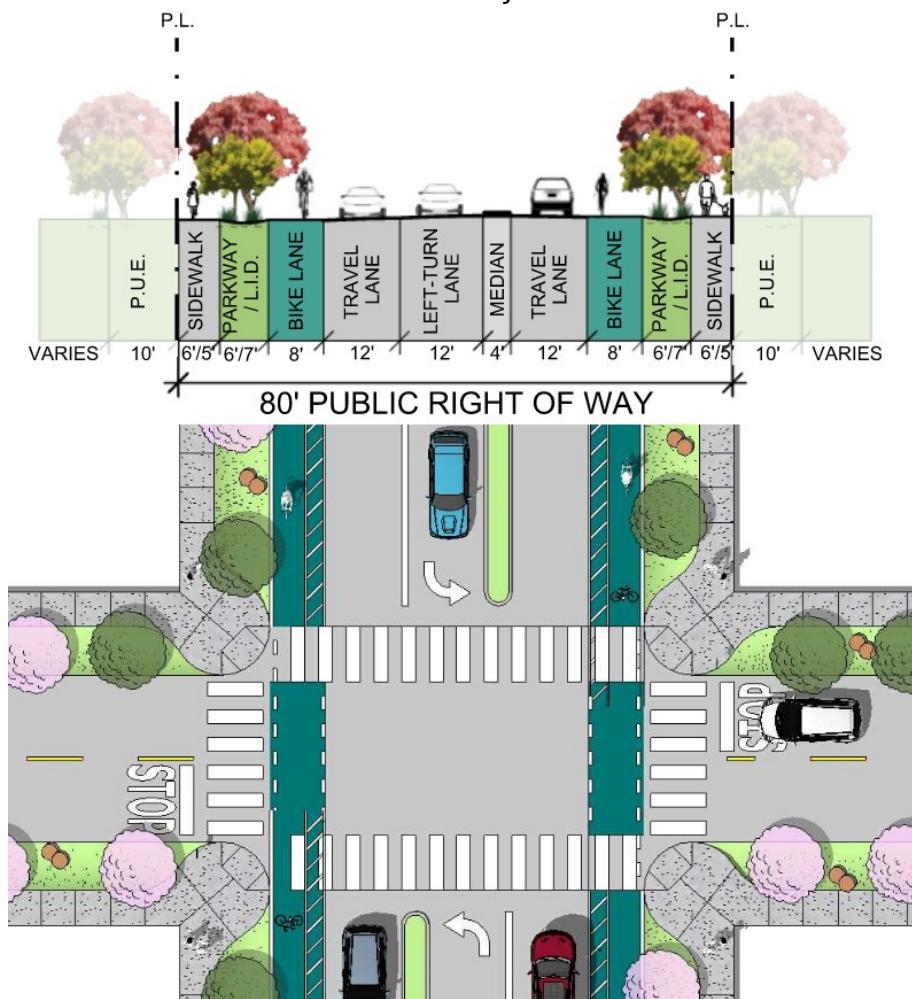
Collector 'A' Adjacent to Village Commercial
